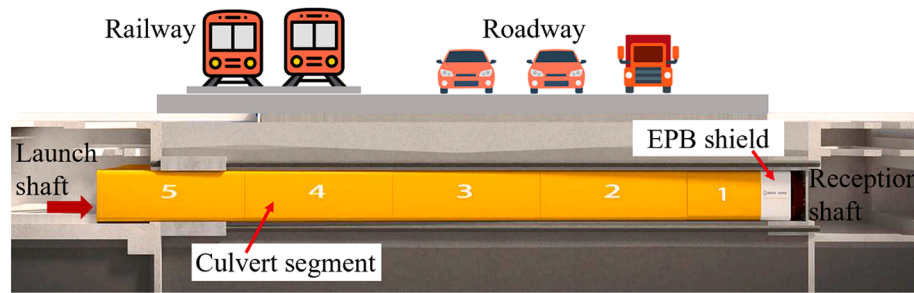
Schematic view of culvert jacking tunnelling under existing facility.
